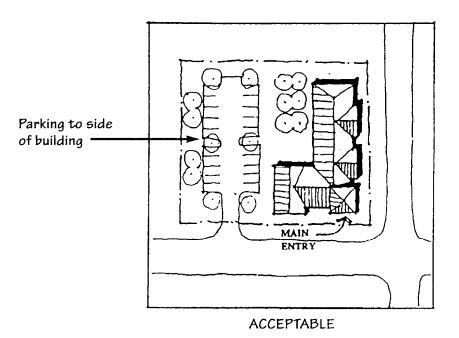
PARKING LOCATEDTO SIDE OF BUILDING
